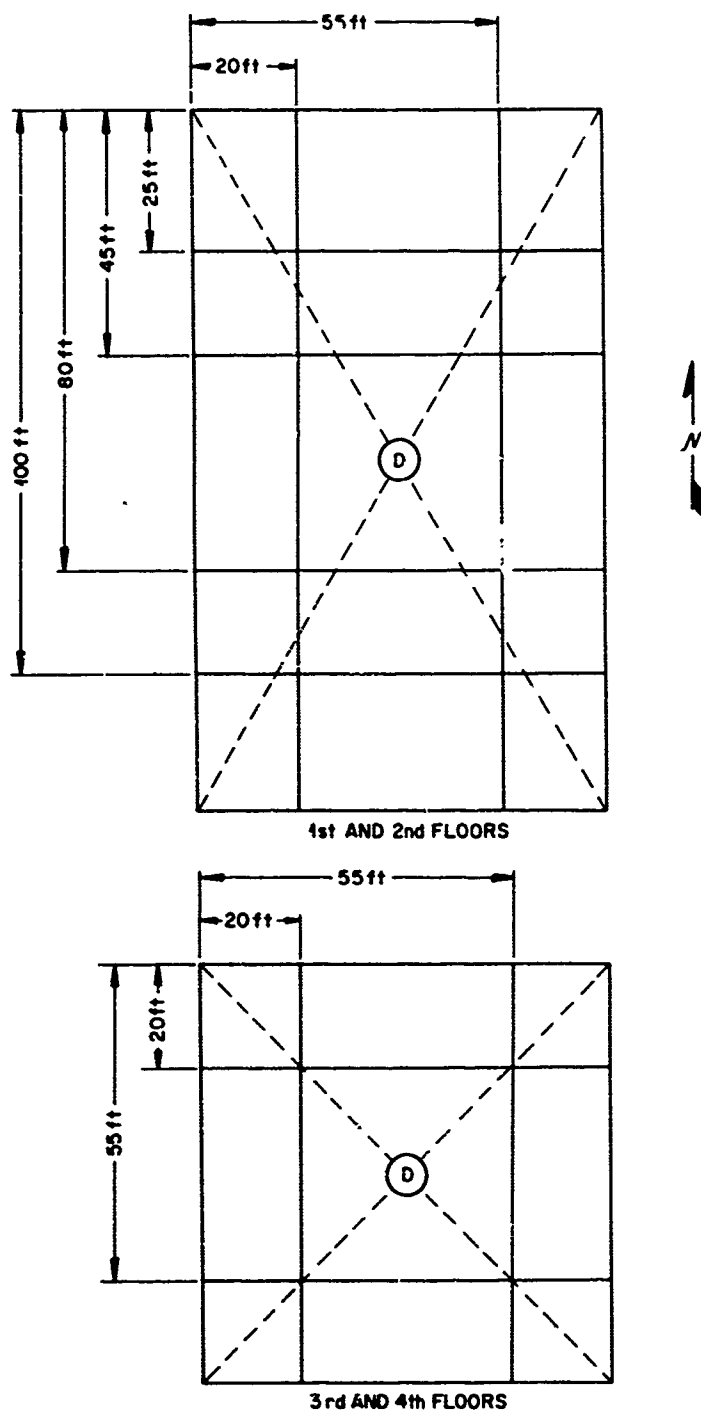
Partition Layouts of Floors 1 to 4 in Building No. 3.
